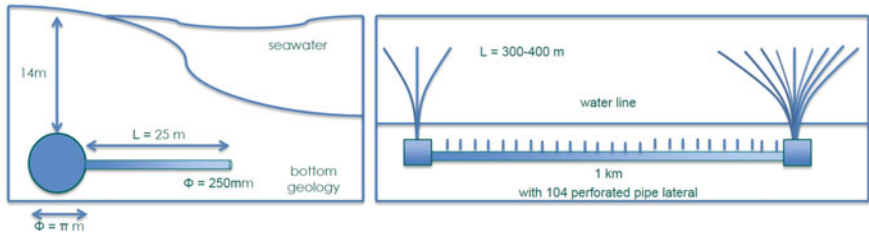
Water tunnel intake system design at Alicante, Spain (from Rachman et al. 2014)
